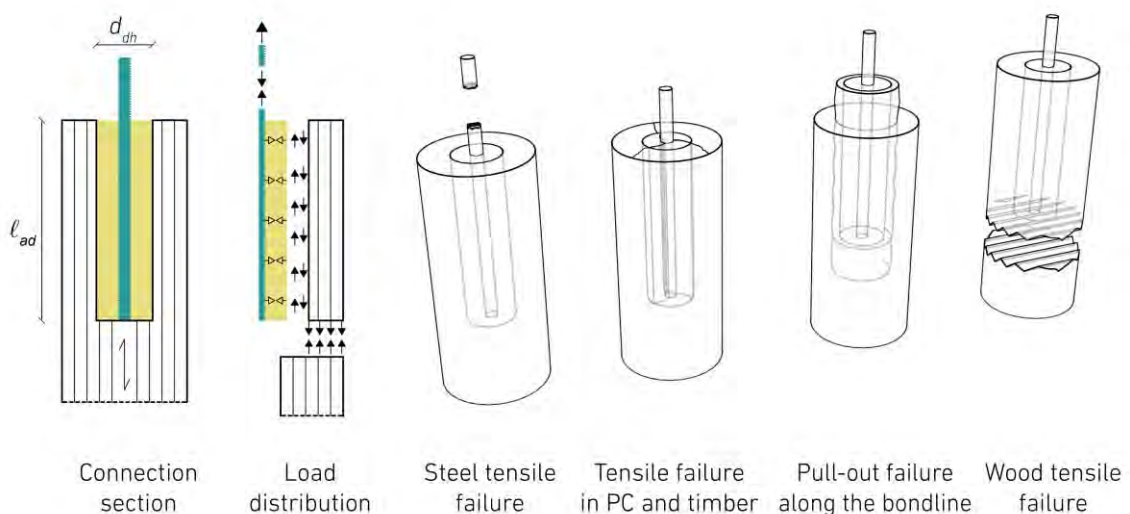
Section, load distribution and failure types of grouted rods in wood
